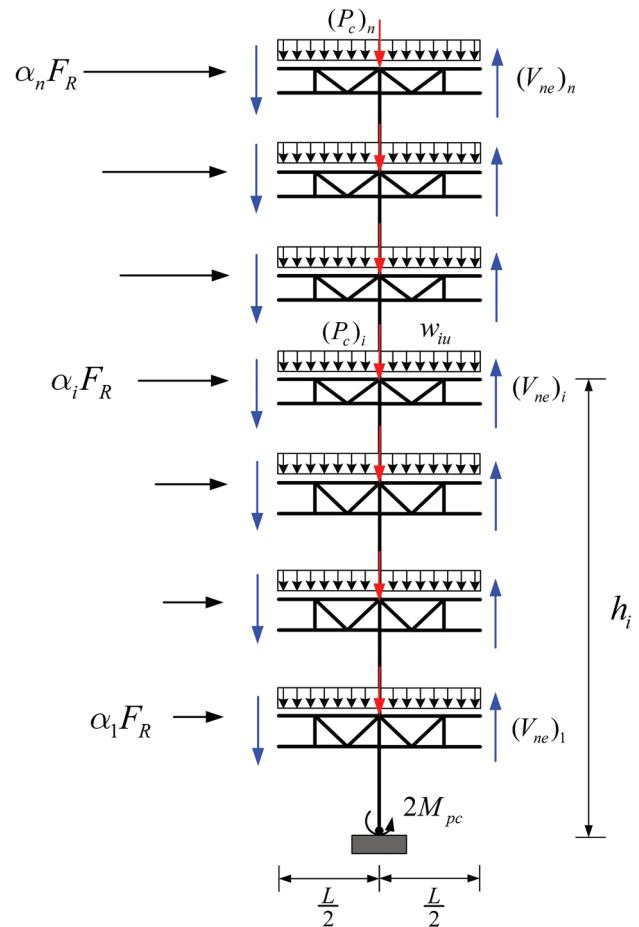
Free-body diagram of an interior column and associated truss girder branches subjected to lateral forces to right.
